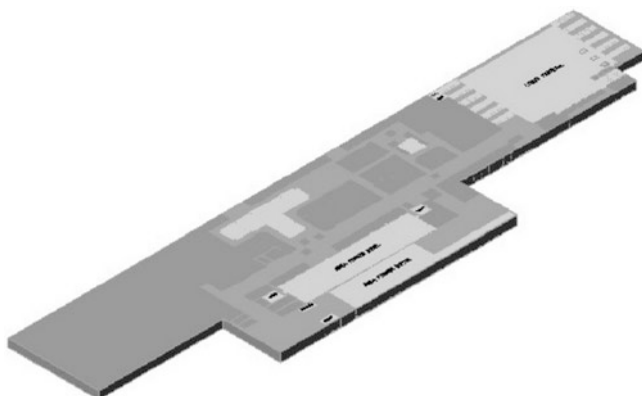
Solid 3D shape of Blok M mall building at B1 floor
